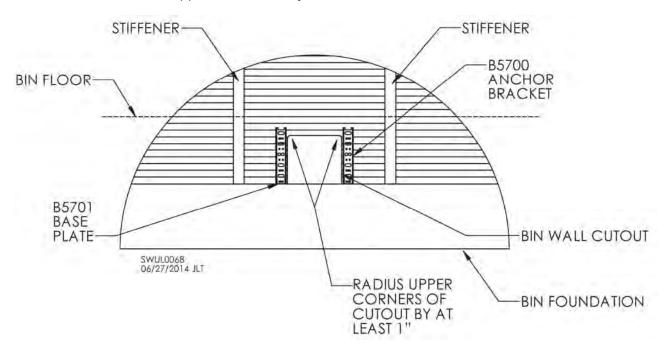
20" cutout reinforced by 22" anchor brackets (B5700) and base plates (B5701)
